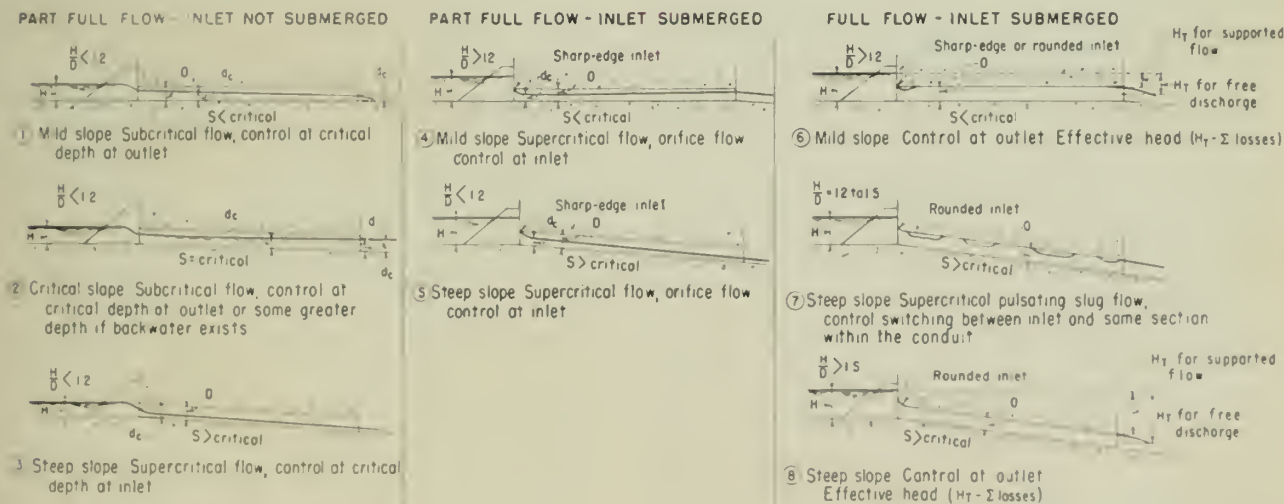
Typical flow conditions—culvert spillways on mild and steep slopes.
